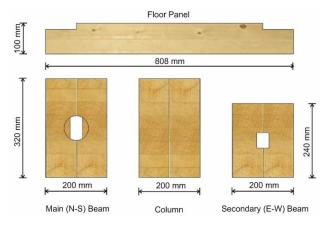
Section sizes used in glulam test frame, beam-column and column-foundation connection details
